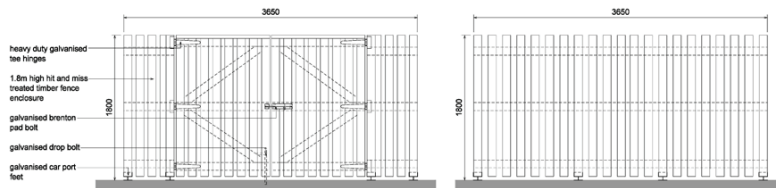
PROPOSED REFUSE ENCLOSURE ELEVATIONS - NOT TO SCALE
